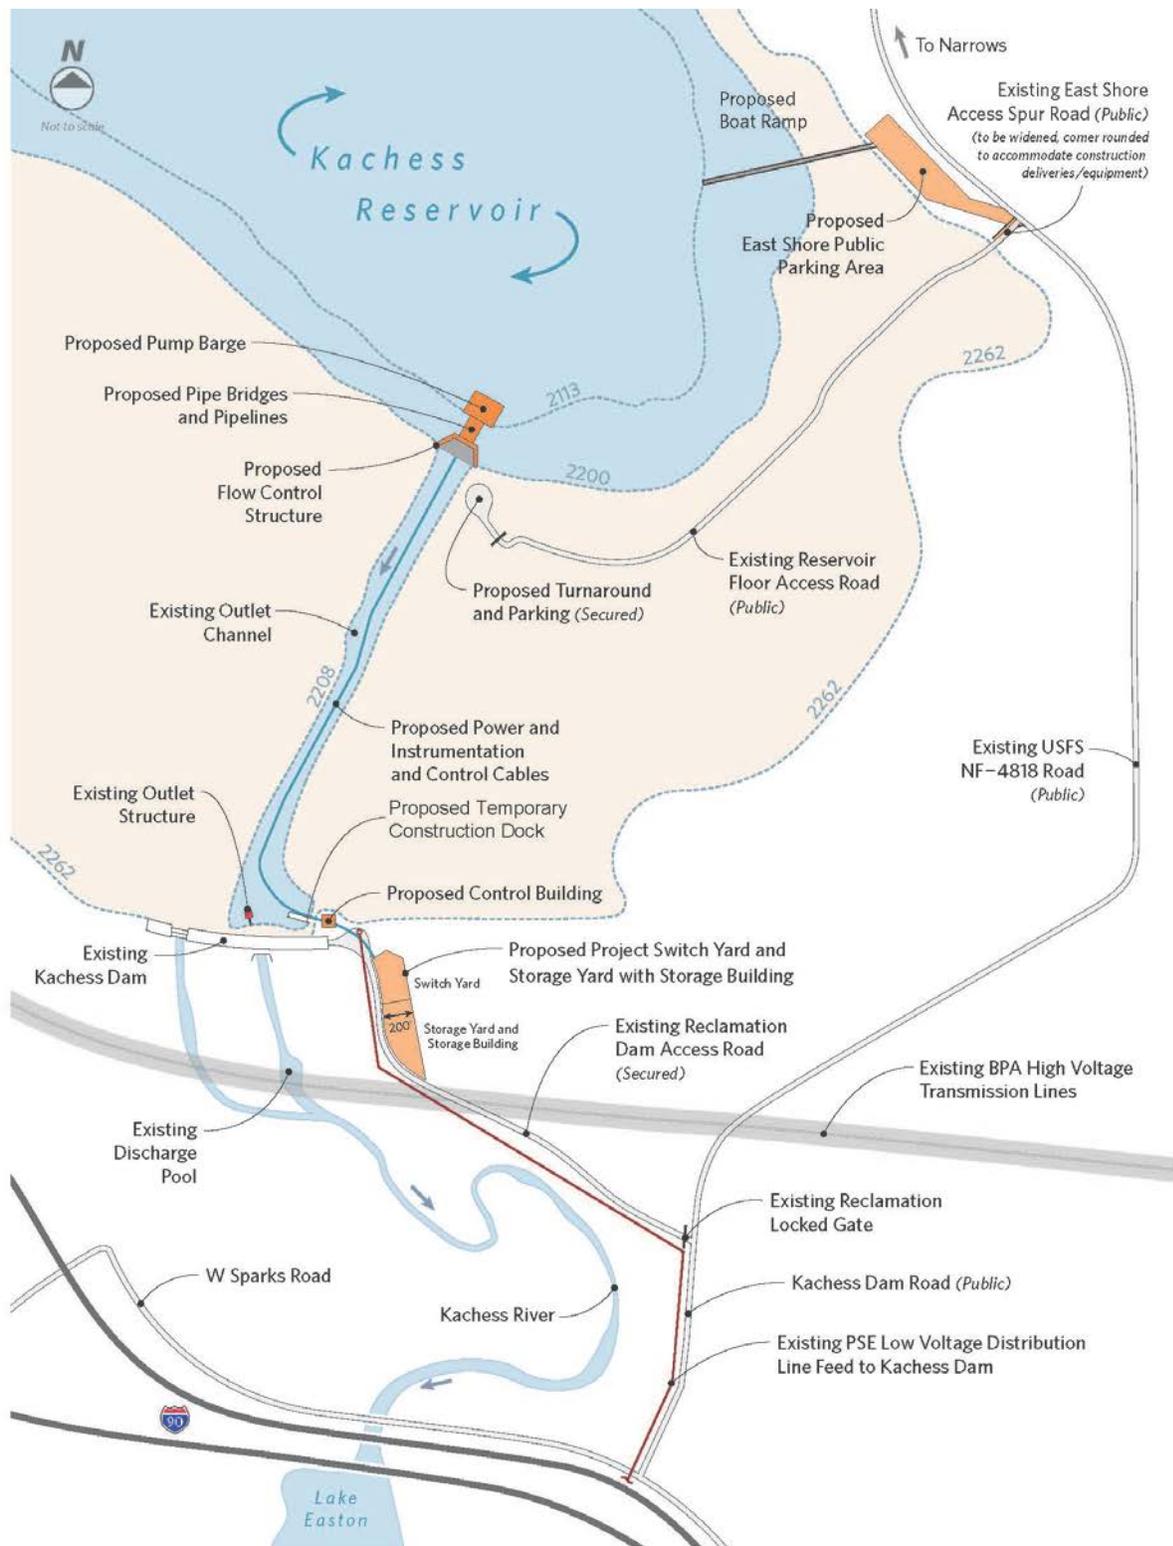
Conceptual Site Plan - Alternative 4 – KDRPP Floating Pumping Plant
